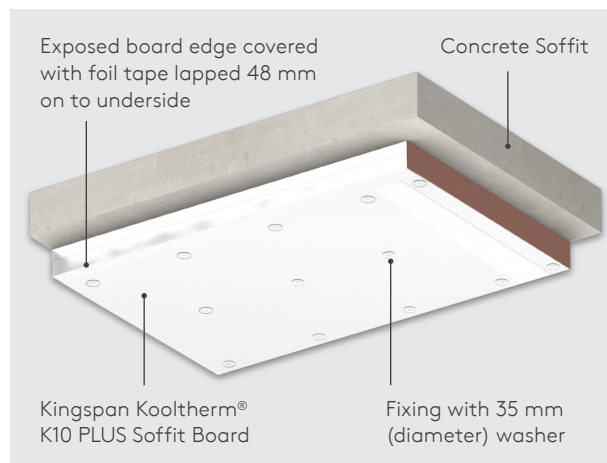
Protection of exposed insulation edges of Kingspan Kooltherm® K10 PLUS Soffit Board
